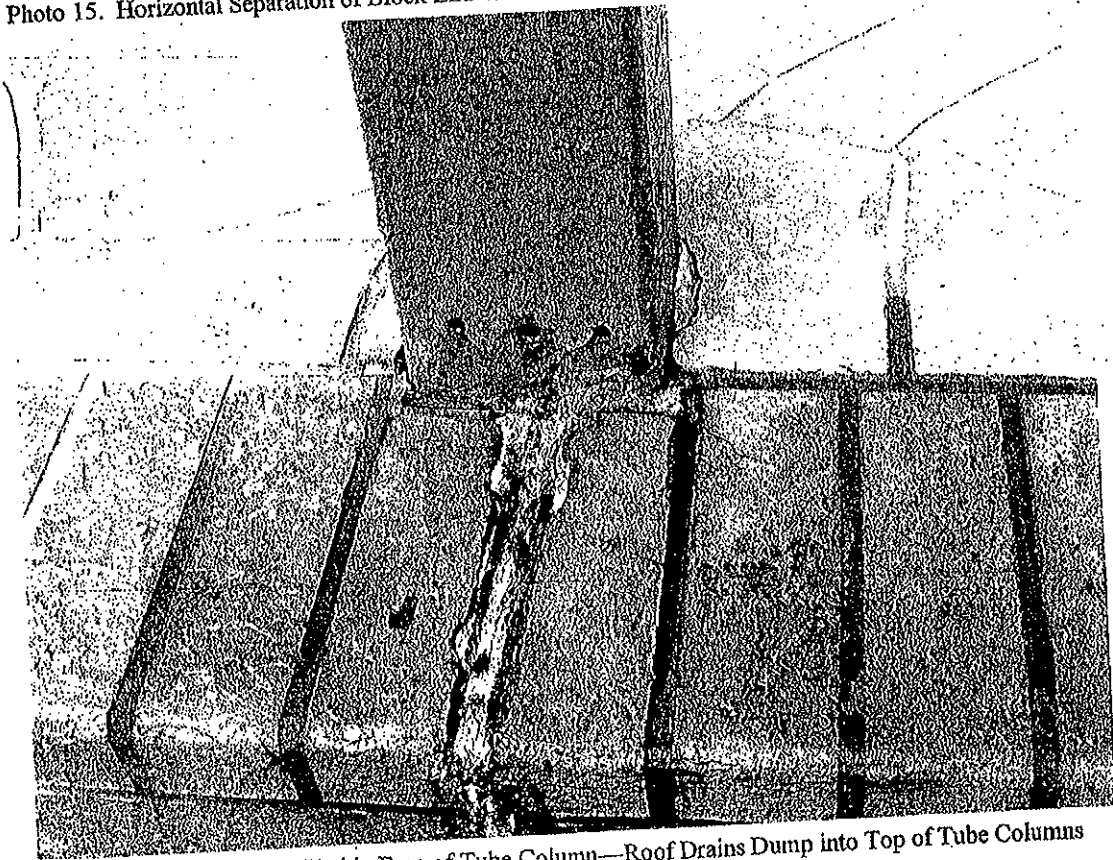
New Holes Drilled in Face of Tube Column—Roof Drains Dump into Top of Tube Columns
